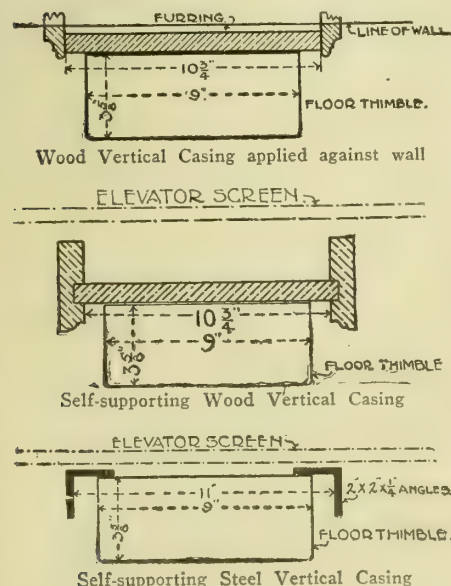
HORIZONTAL SECTIONS SHOWING TYPES OF VERTICAL CASING CONSTRUCTION
